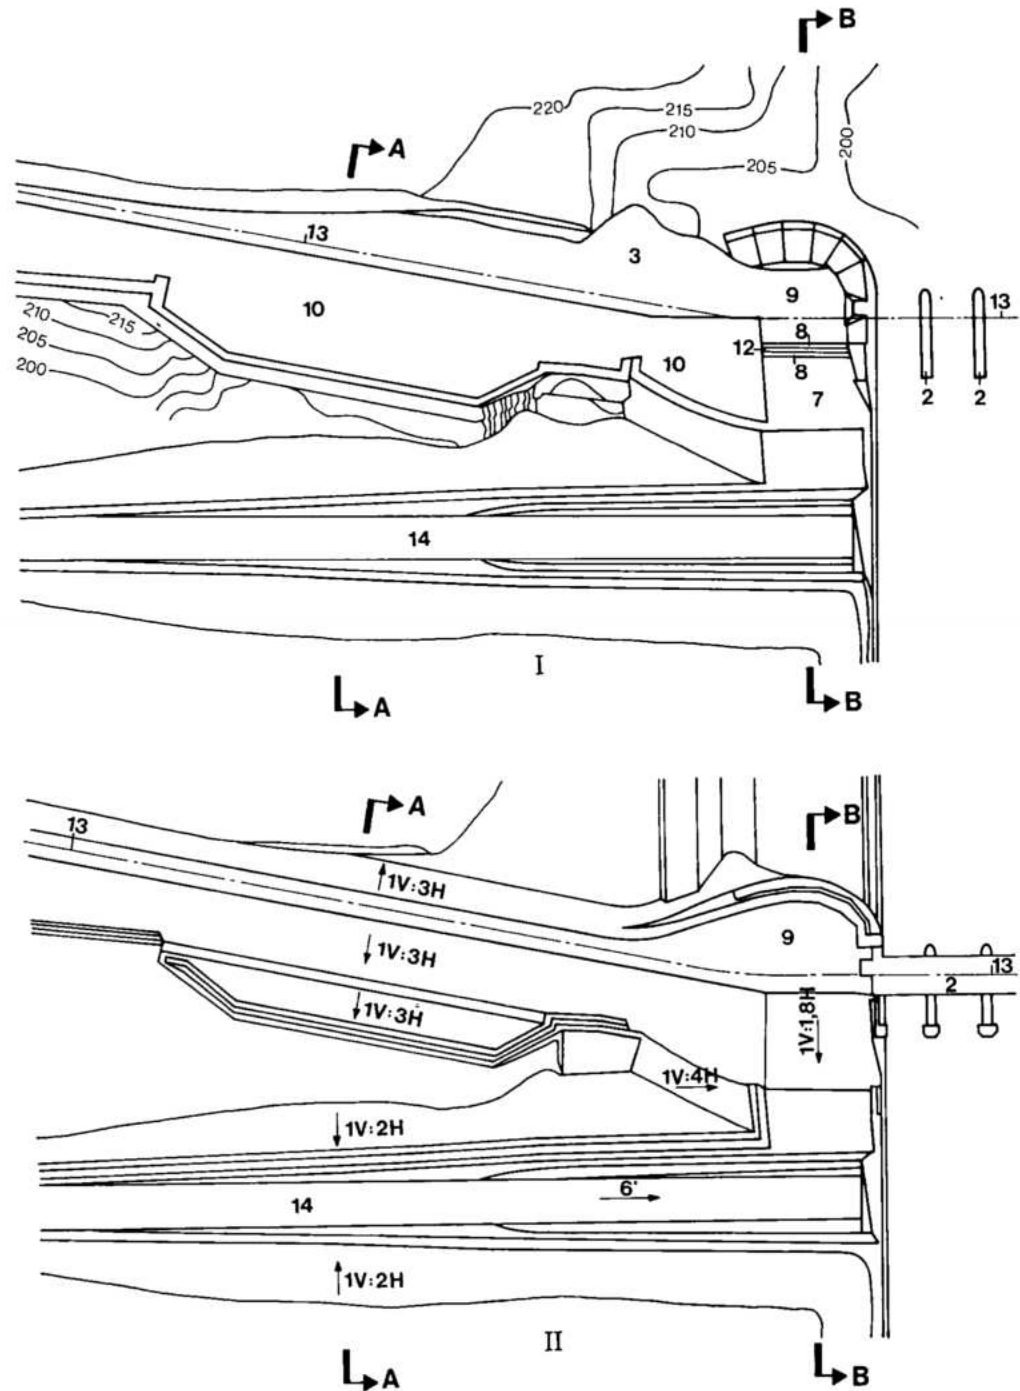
Transition between right earthfill dam and the spillway - Plan view (for nomenclature, see Fig. 7.5)
